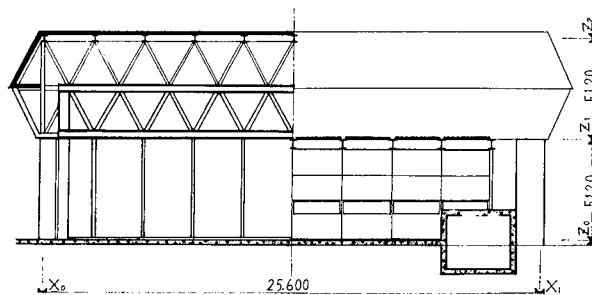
Side view of R.C. (Rocket Center) (a'-a)
